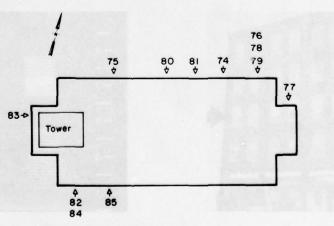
Portsmouth Harbor Station, New Castle, New Hampshire.
